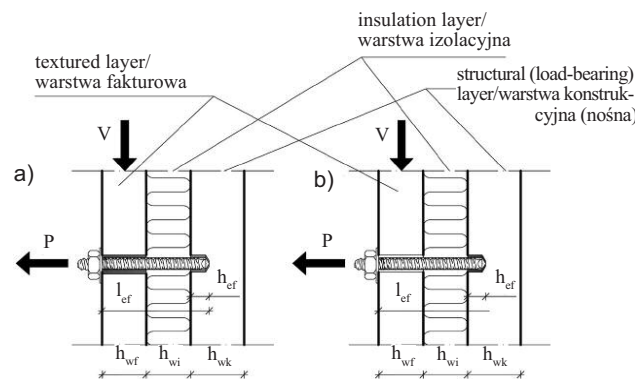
Scheme of mounting a single bonded anchor: a) full anchoring in the textured layer and in the structural layer; b) anchoring only in the structural layer
